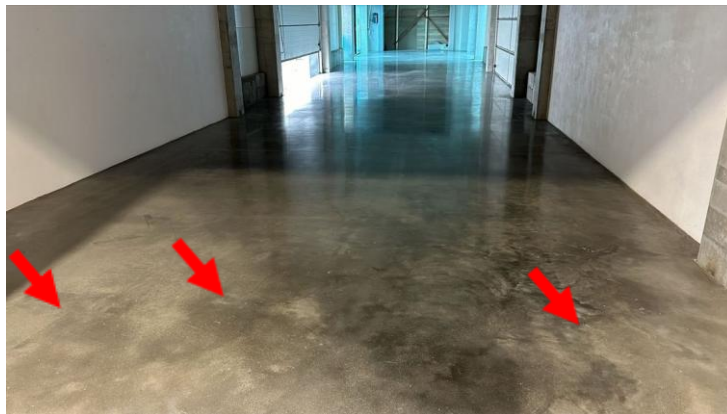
Concrete industrial floor (Example 2) before renovation: arrows indicate cold joints
